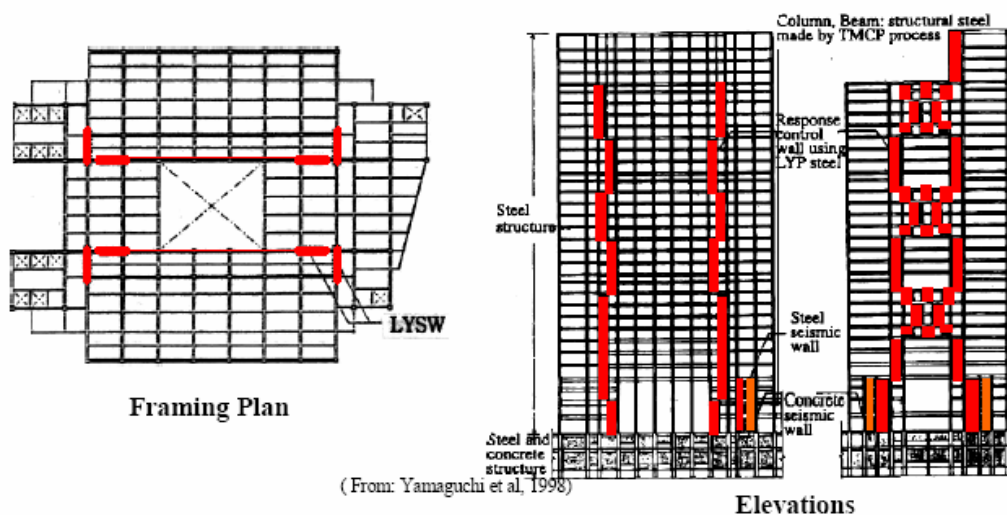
Framing plan and elevations of the 31-storeys building in Japan reinforced with low-yield steel shear walls
